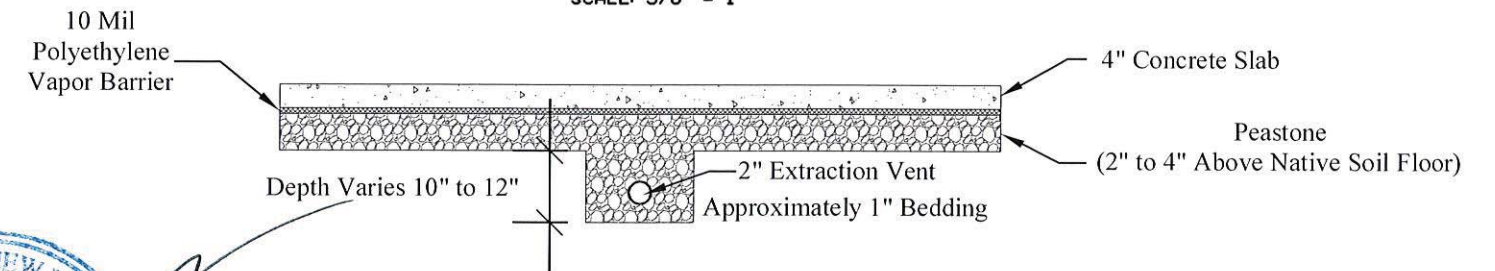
SSDS Typical Extraction Vent Schematic
